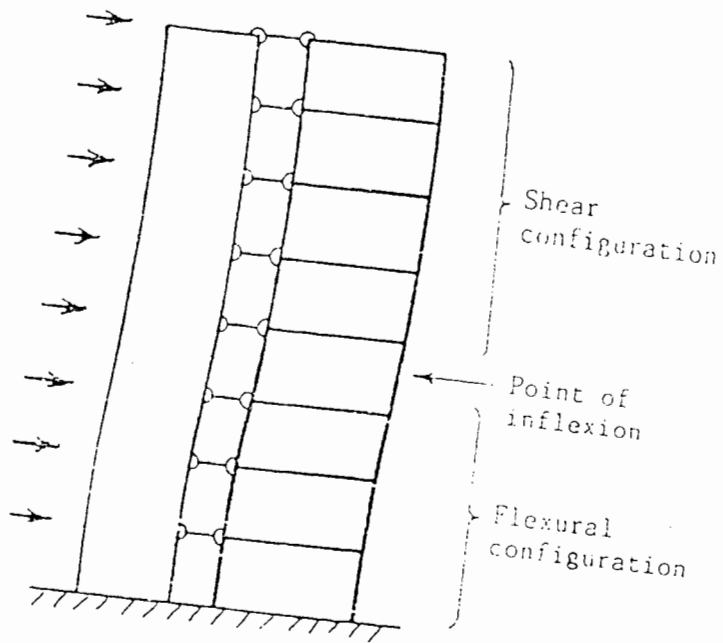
Typical Deflected Shape of wall -frame structure
